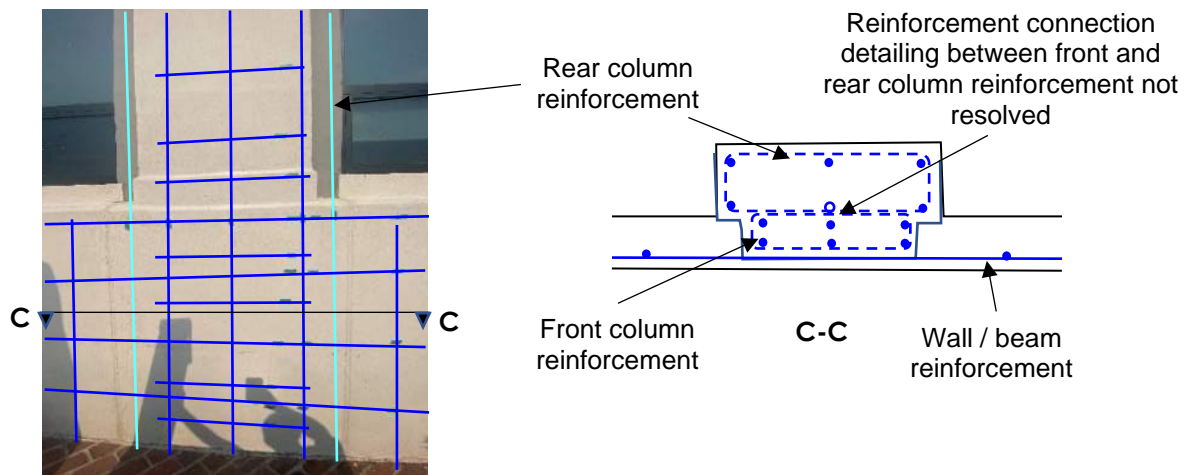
Area 1 Column – Left: Exterior Image of Column annotated with reinforcement layout
